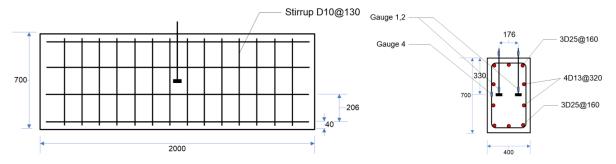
Details of SD6-15db-2TH8 specimen (unit: mm)
